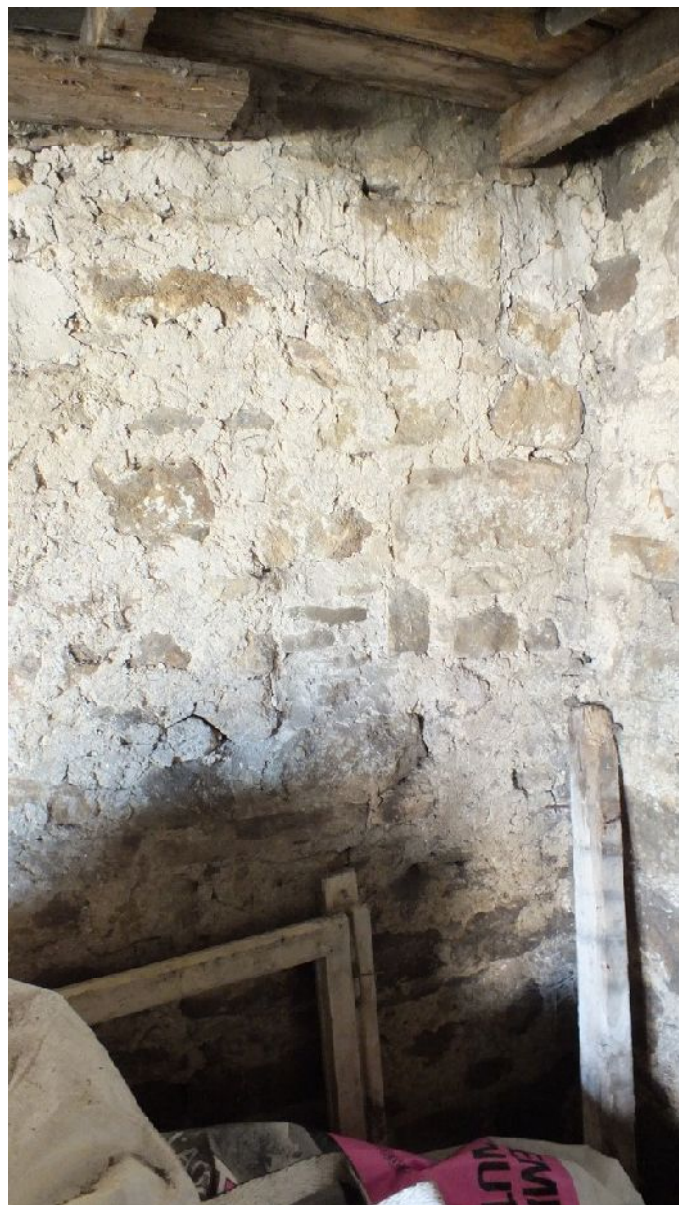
(left): Alcove in the south-east internal elevation of Barn 3 at ground floor level
